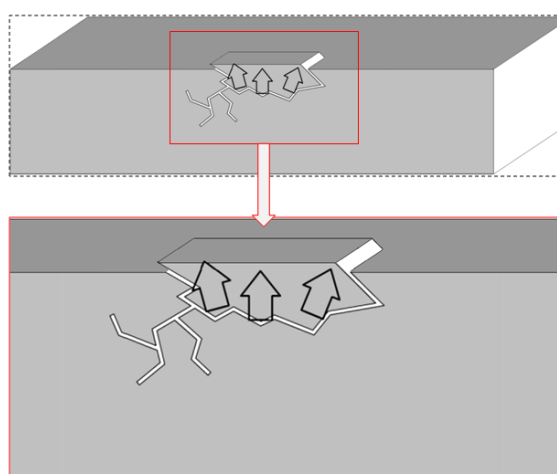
Diagram of spalling destruction of surface layer of concrete pavement.
